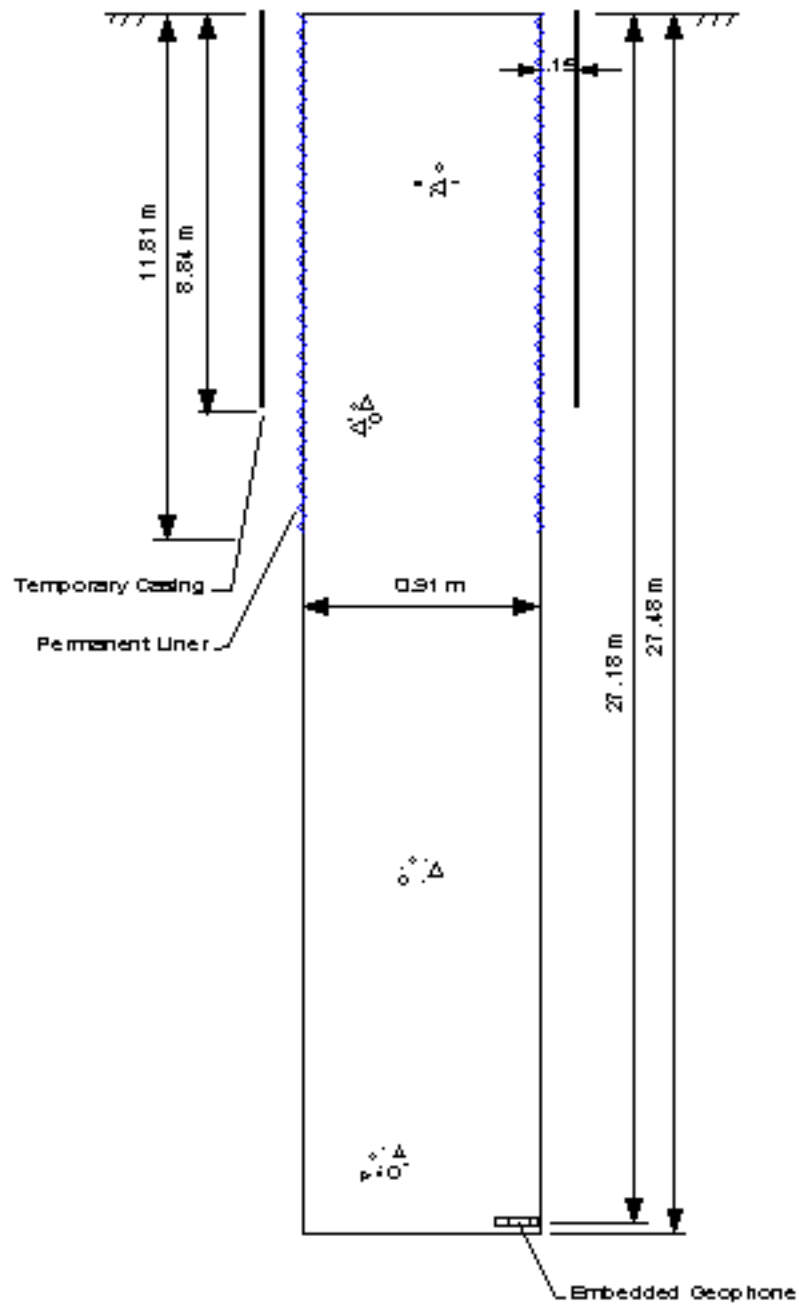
Detailed Schematic of Shaft 5 - Accessible-Head Condition
